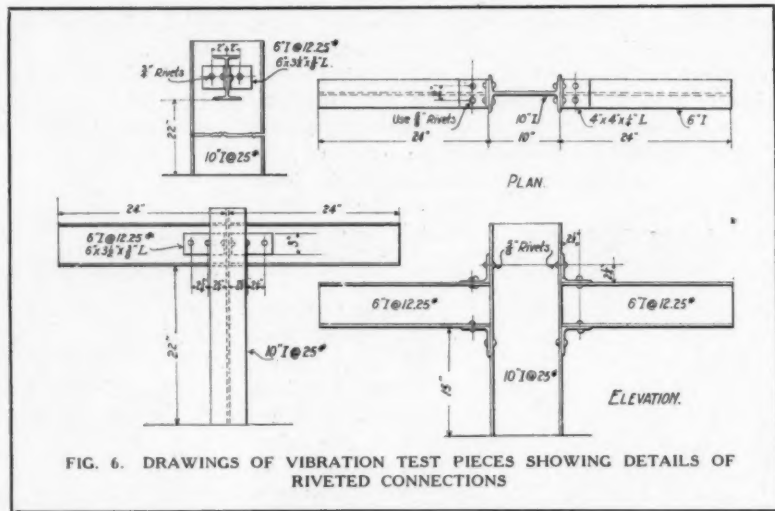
DRAWINGS OF VIBRATION TEST PIECES SHOWING DETAILS OF RIVETED CONNECTIONS
